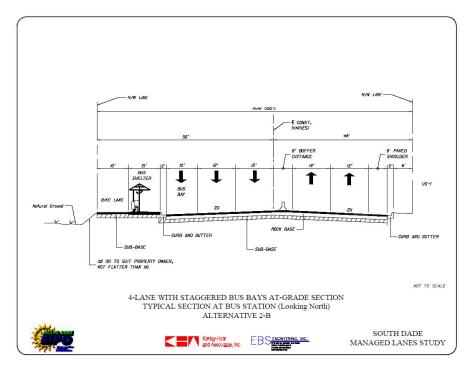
Typical Cross Section of the Four-Lane Alternative at a Station
